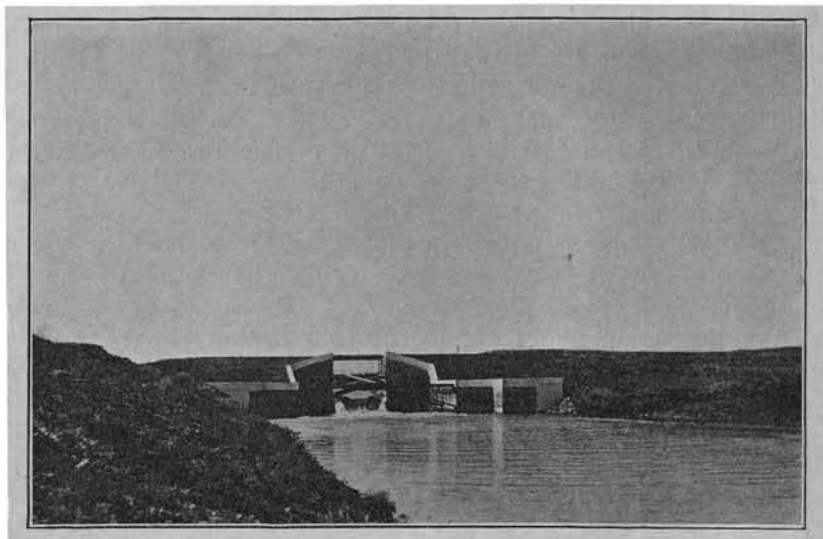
10-Foot Fall on Calgary Canal, Alberta.
